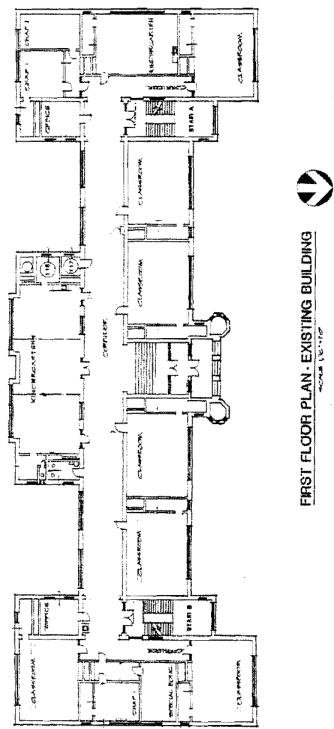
First Floor Plan of the Hempstead School (Woolridge, 2007, Hempstead School National Register Nomination).
